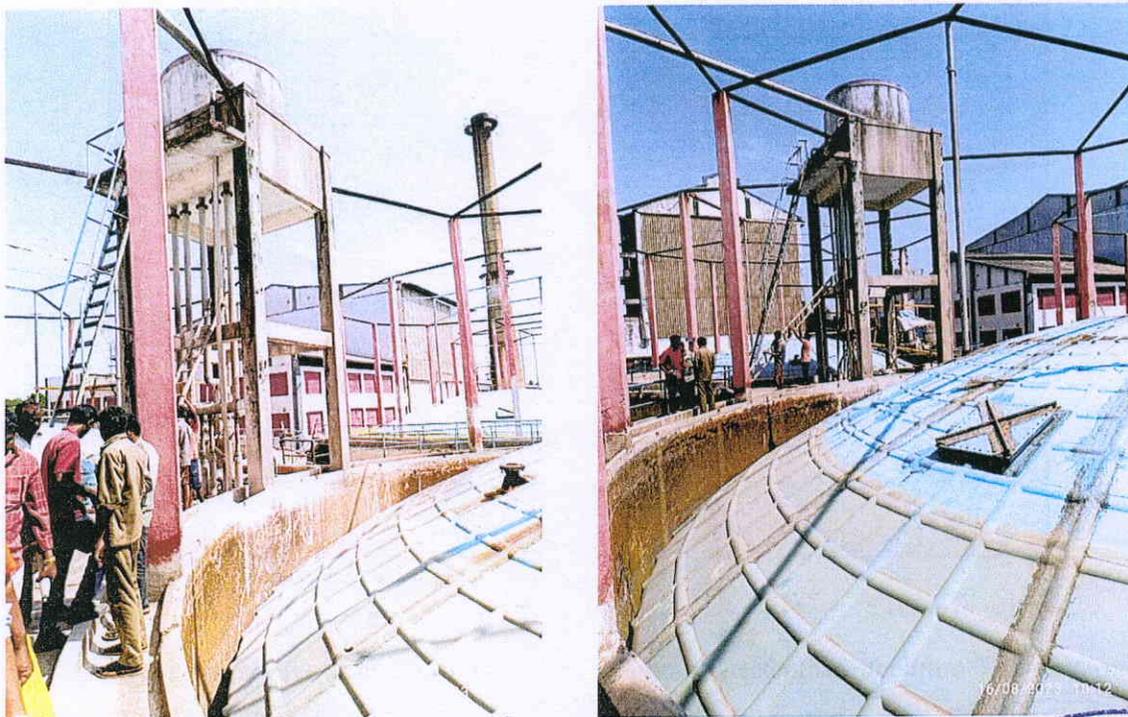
Rebound Hammer Test conducted on Overhead Tank
